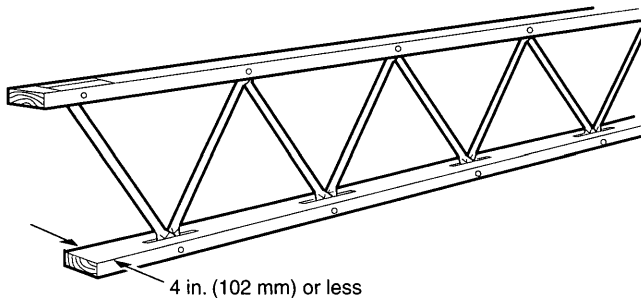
(a) Wood Bar Joist Construction.
